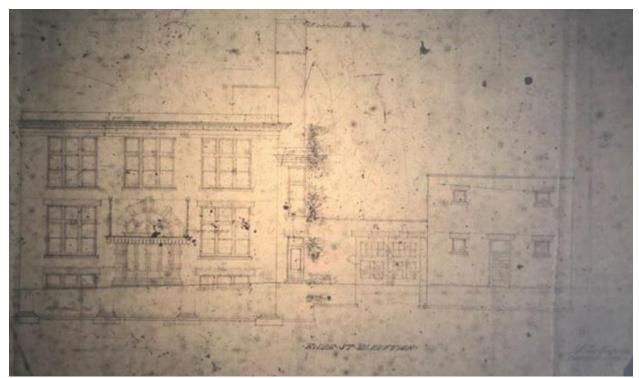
Architectural drawing (1910) of the front (River Street) elevation of the New Method Laundry building. Original entryway detail, stables, and rear addition shown.
